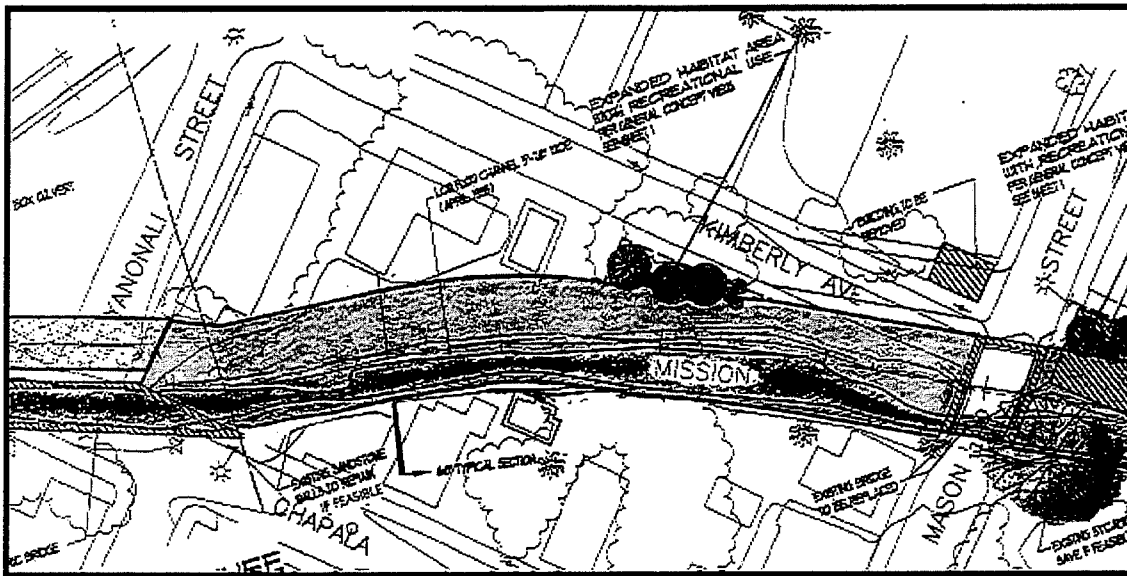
Chapala/Yanonali Street Bridge to Mason Street Bridge
